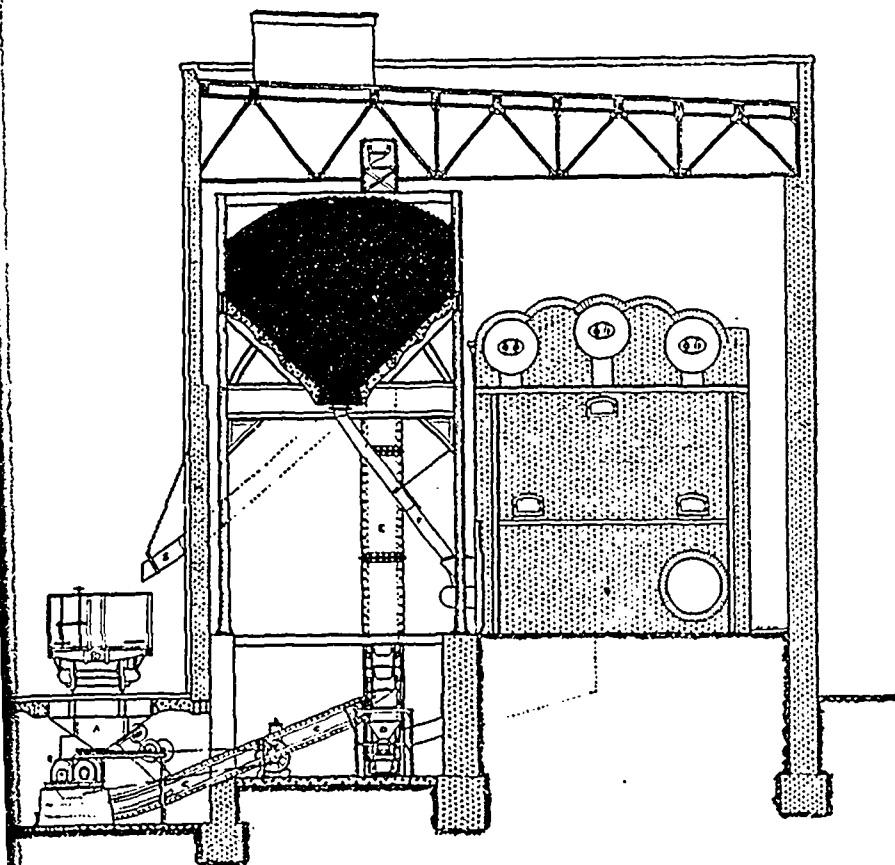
FIG. I.—SECTIONAL VIEW OF BOILER HOUSE.
